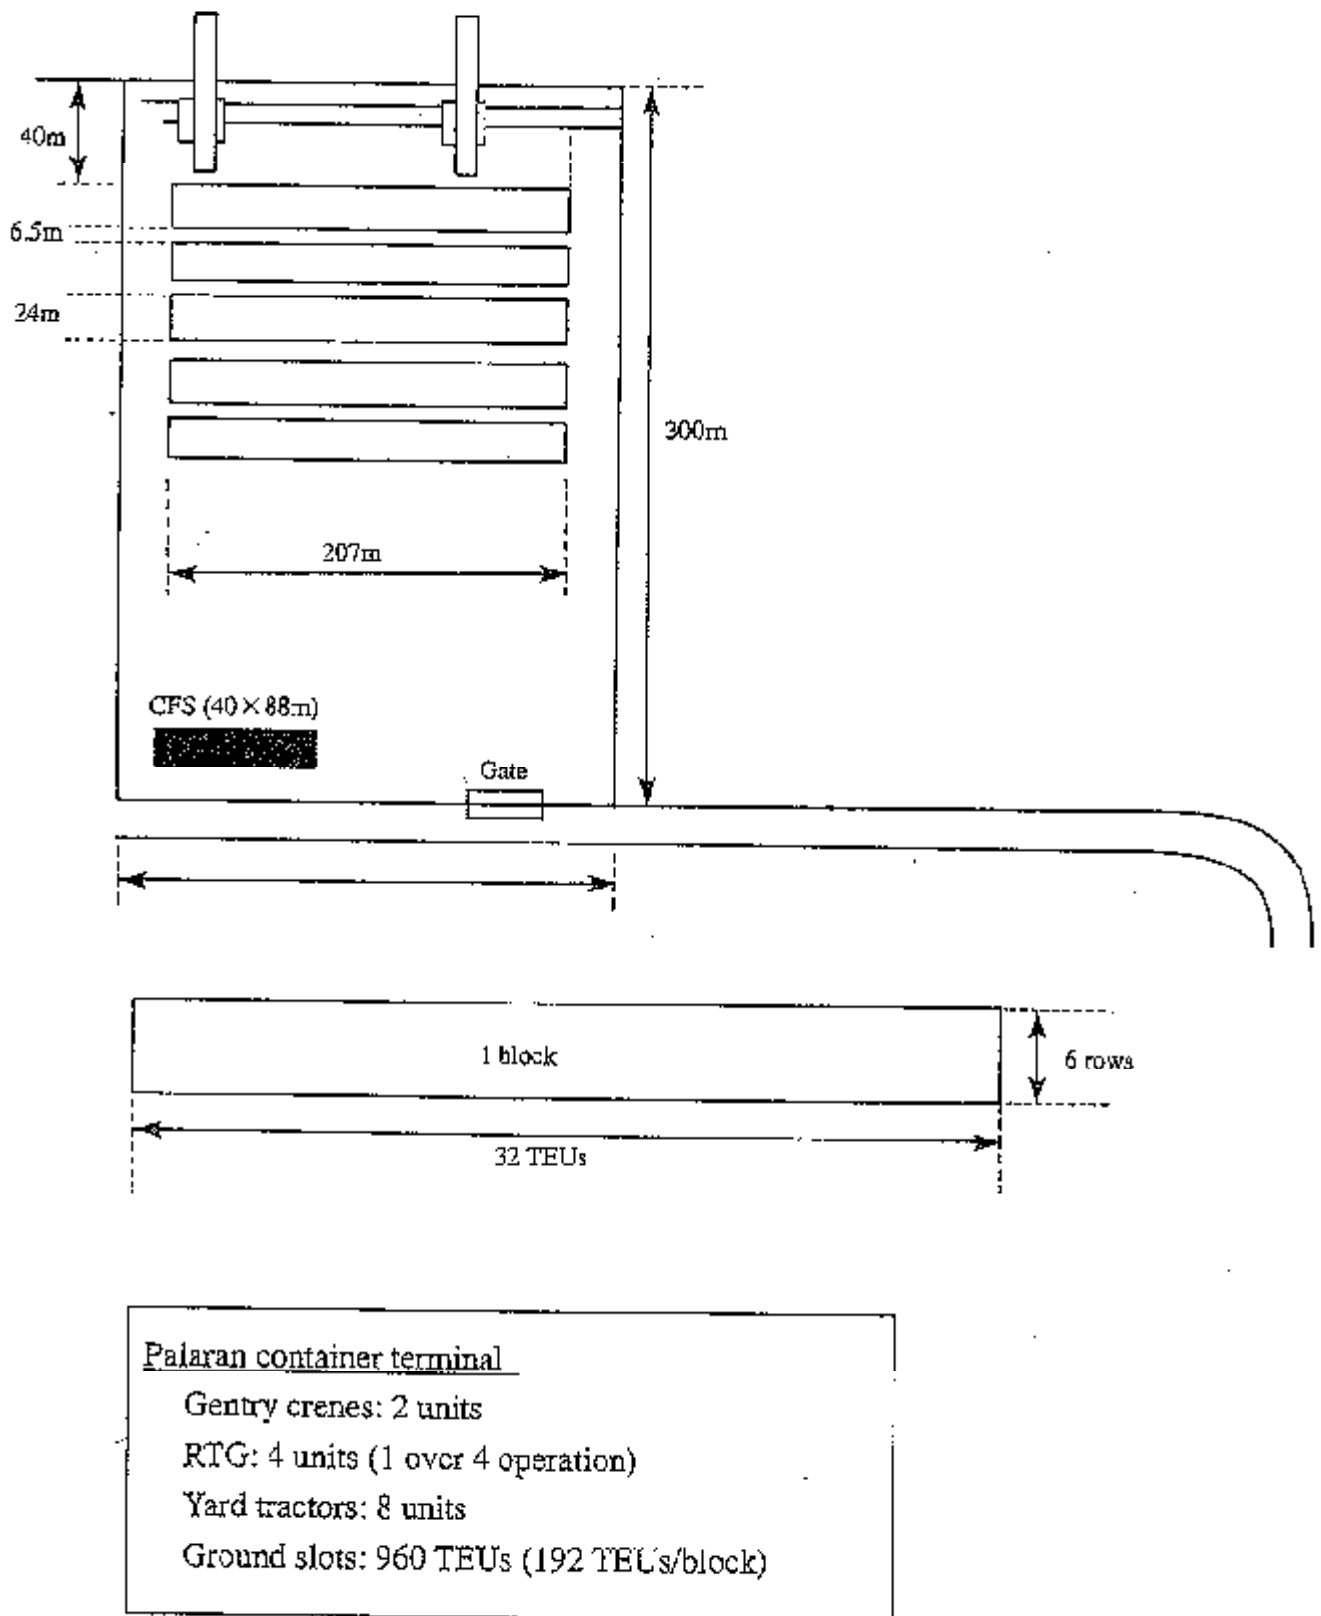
Layout Plan of Palaran Container Terminal in 2007 (4-berth Scenario)
